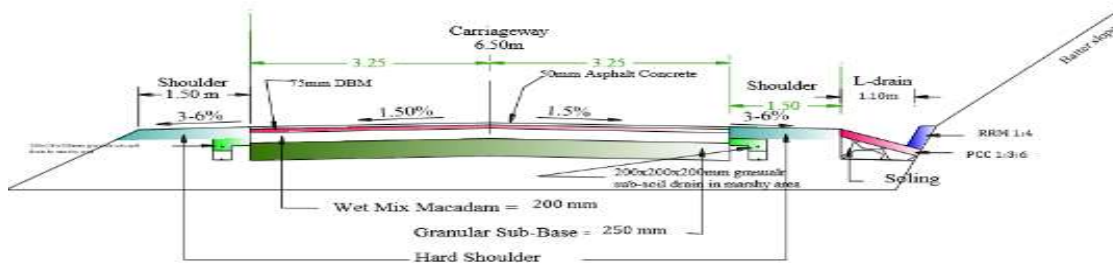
(1)- Design and Drawing aligned to Road Design Standard
